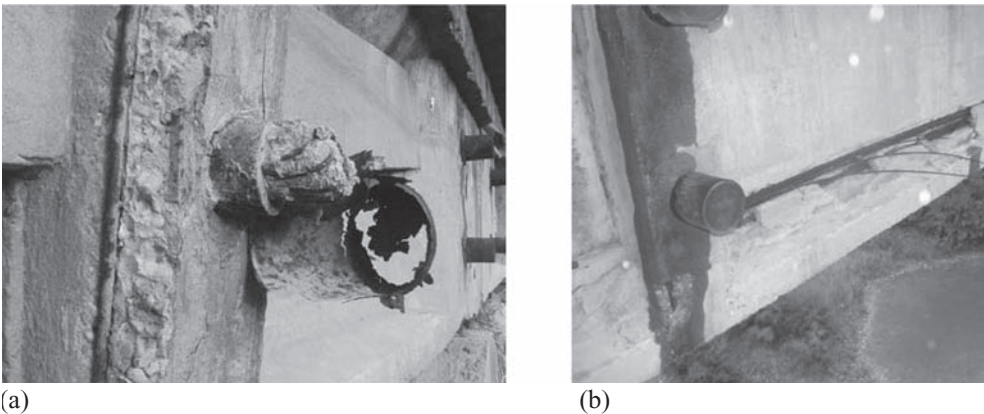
(a), (b) Use of tomato cans to protect the headings of the transversal prestressed cables.
